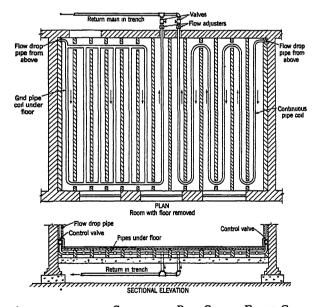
Arrangement of Continuous Pipe Coil in Floor Construction
